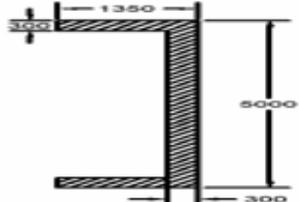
Plan of typical 3-D torsionally asymmetric building Example-2.
